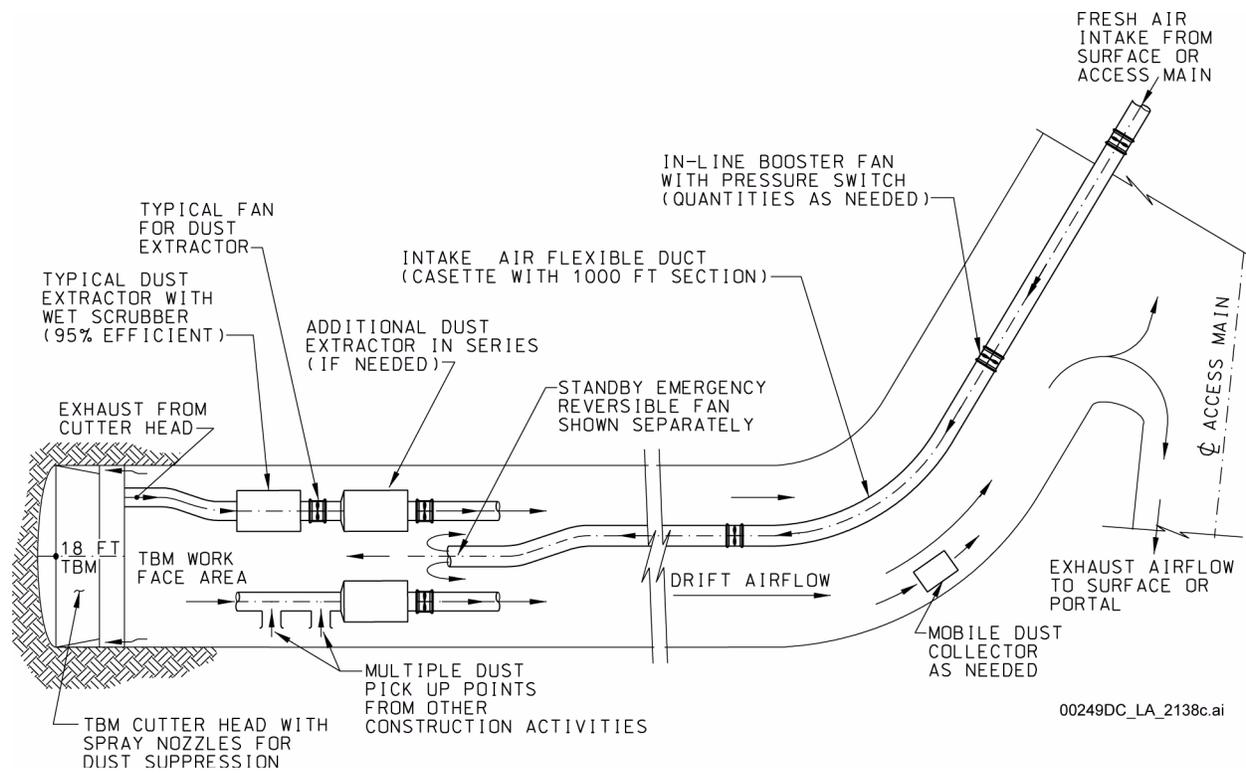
Typical Local Ventilation Arrangement for the Tunnel Boring Machine Excavation
